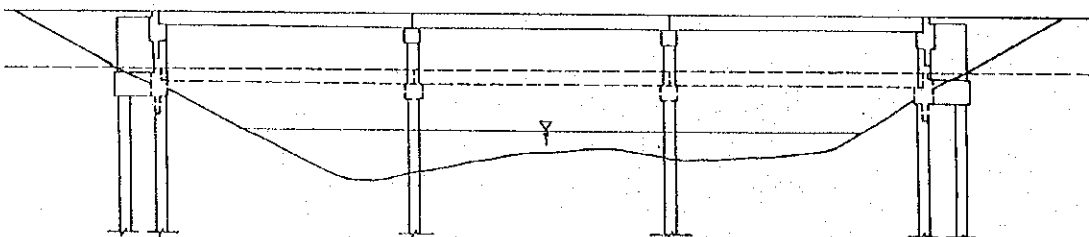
Illustration of Bridge Elevation Raising Method (1)
